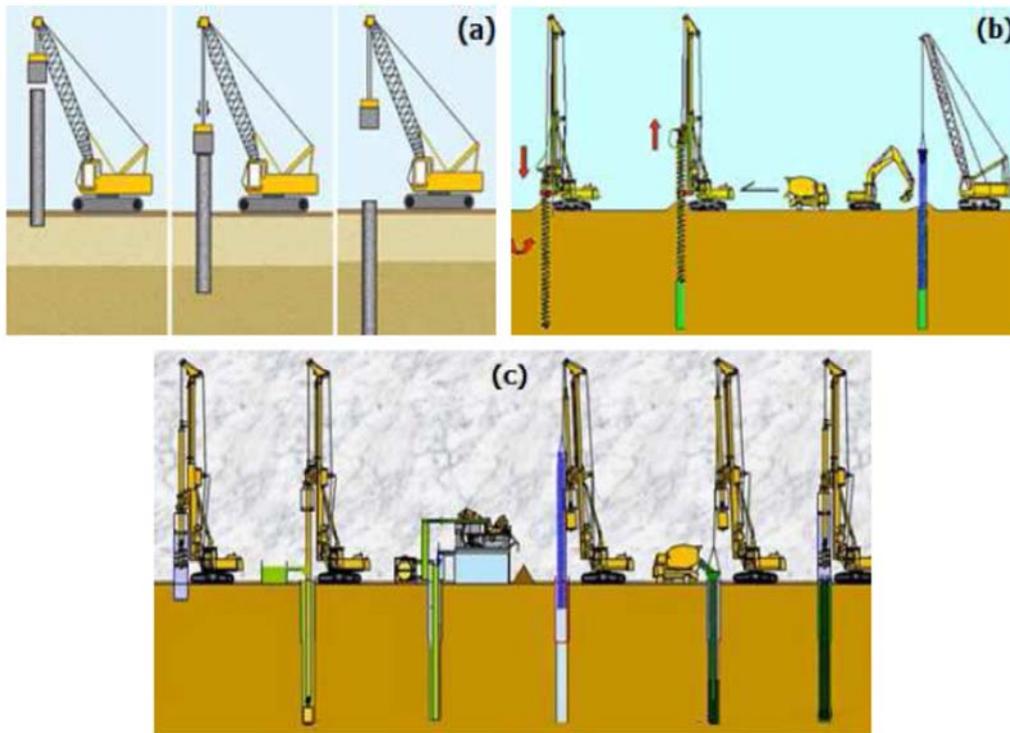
Type of foundation system. (a): driven piles, (b): CFA piles, (c): bored piles
